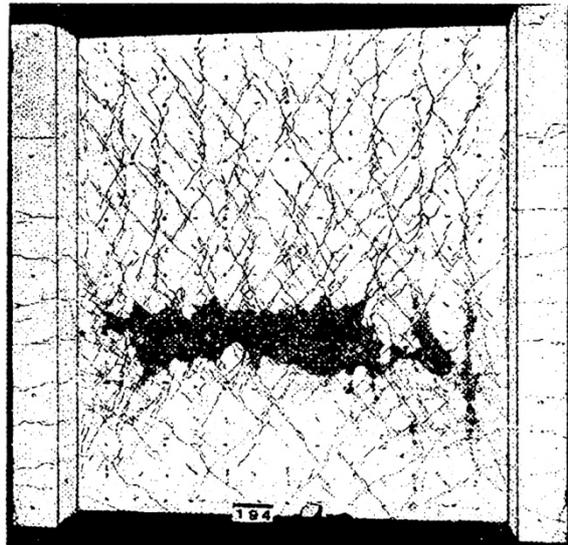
Cracking pattern for wall S7 tested by Maier and Thürlimann (1985) at crushing of diagonal compression struts
